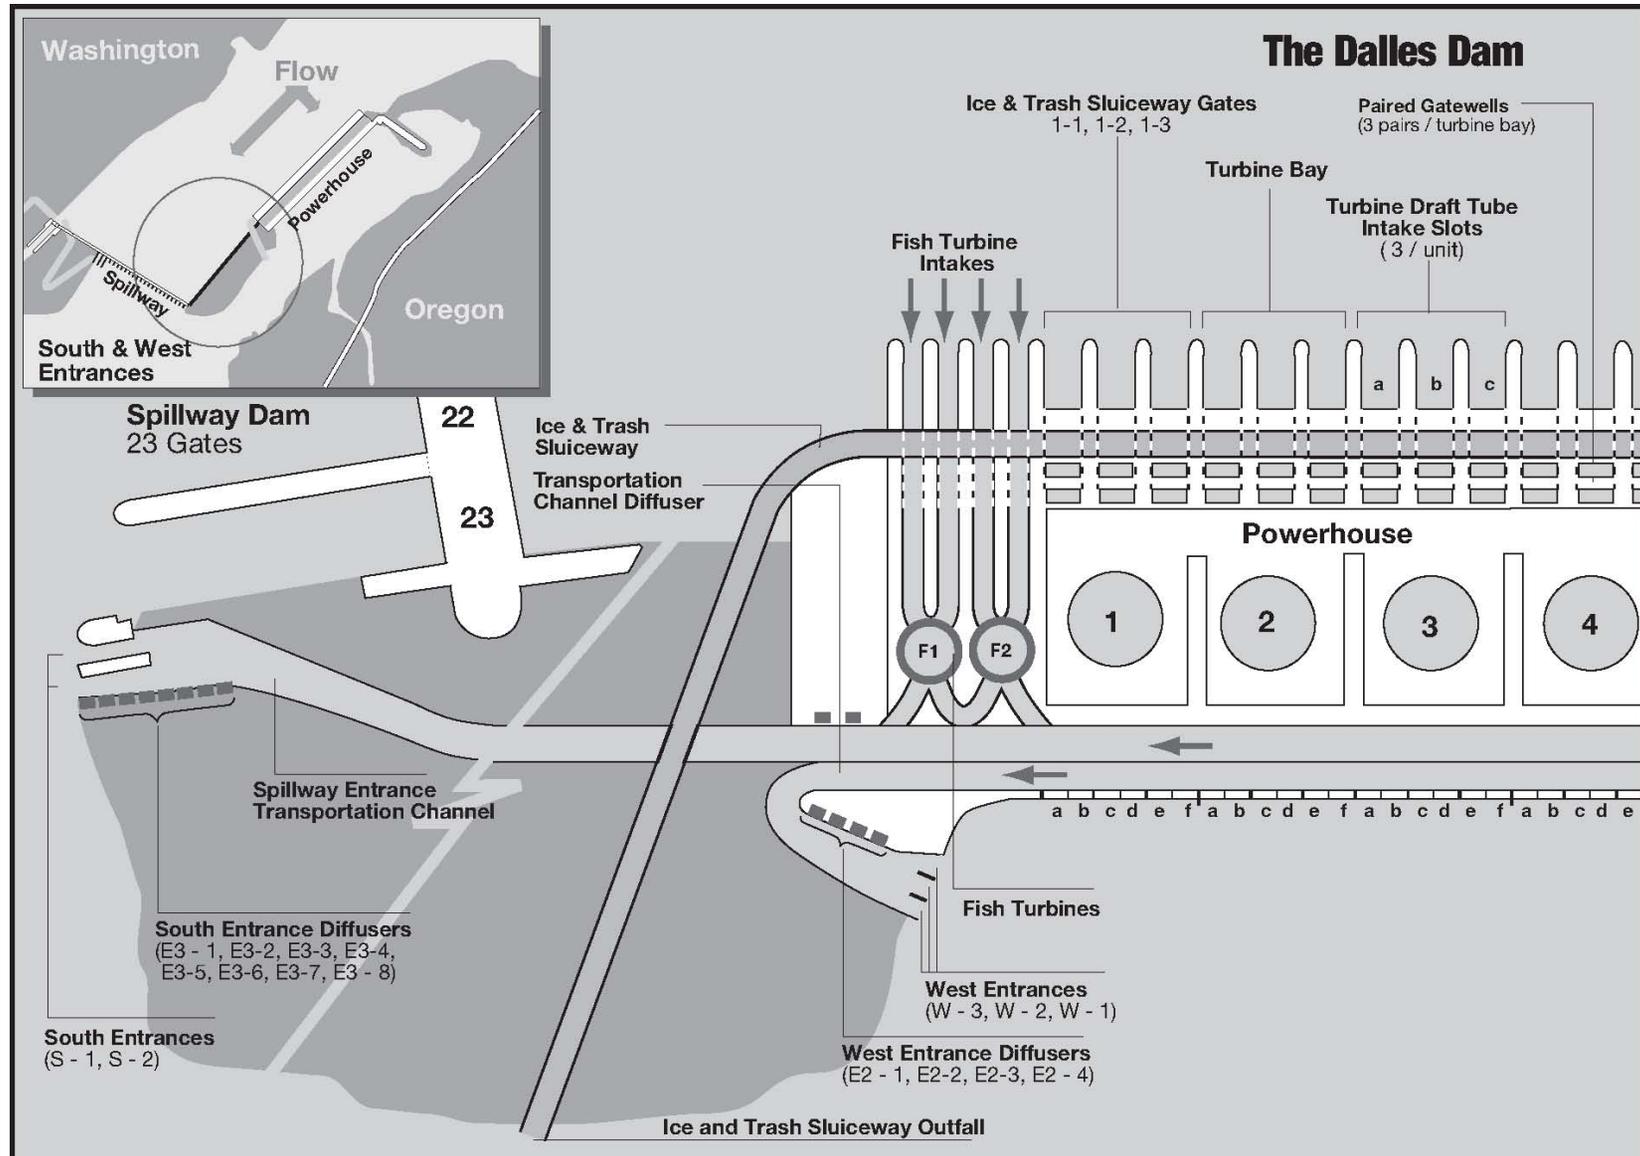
The Dalles Dam South and West Fish Ladder Entrances (courtesy of USACE).
